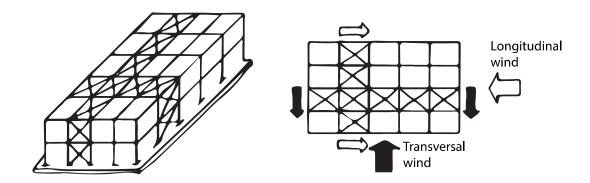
Lateral stabilization of a hall type building (Klasson, 2015).
